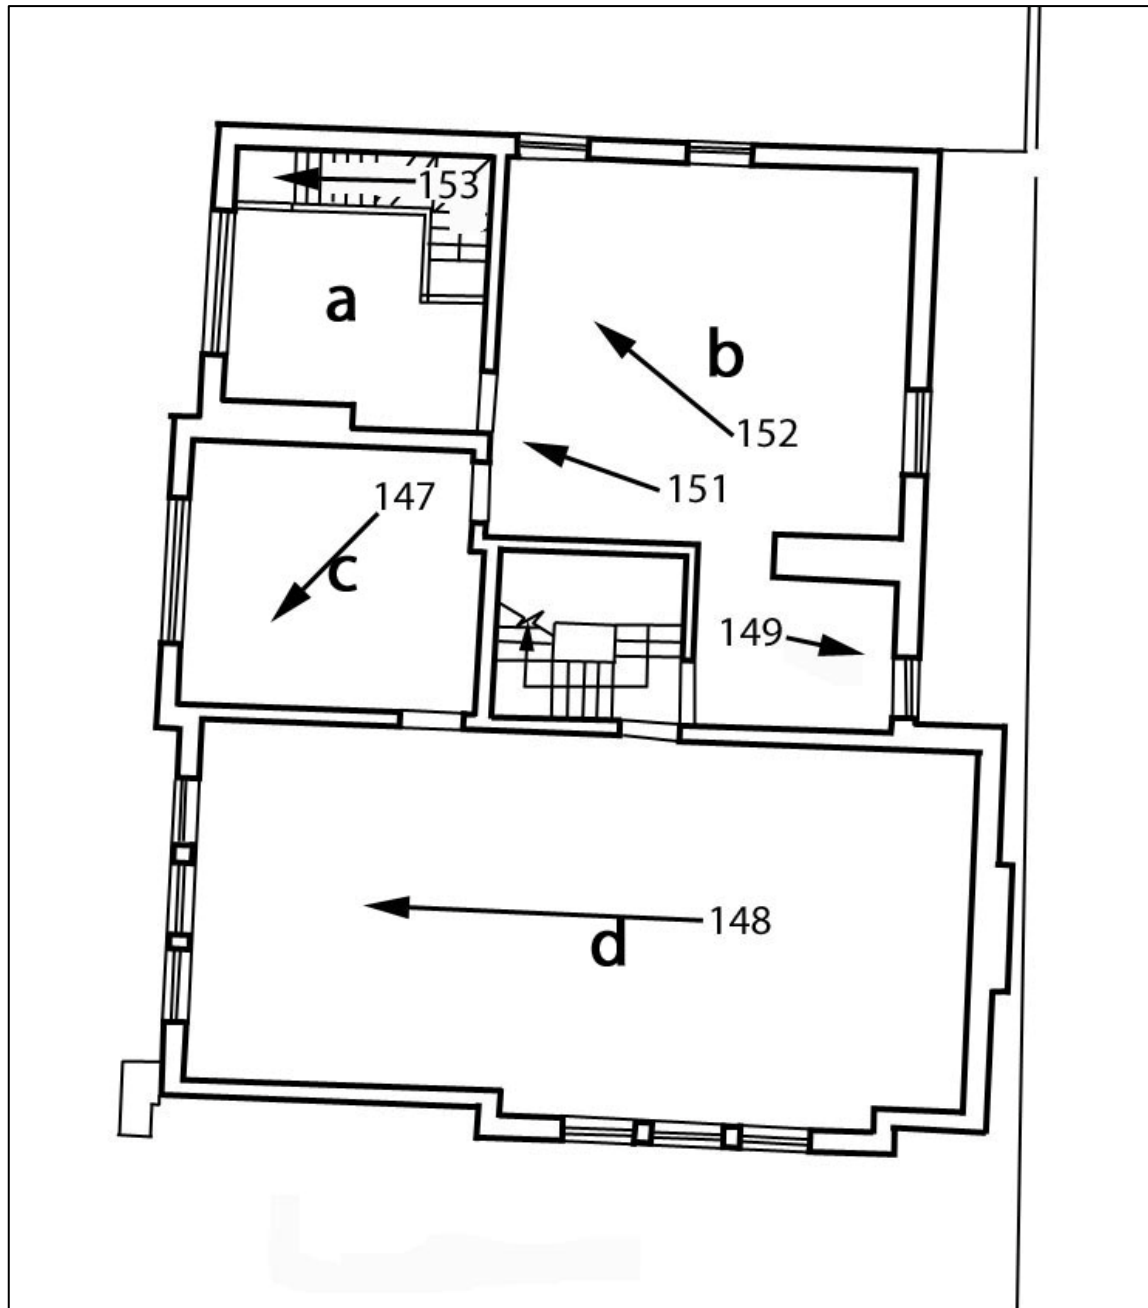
Photographic viewpoints on the first floor of building 'GF1'.
